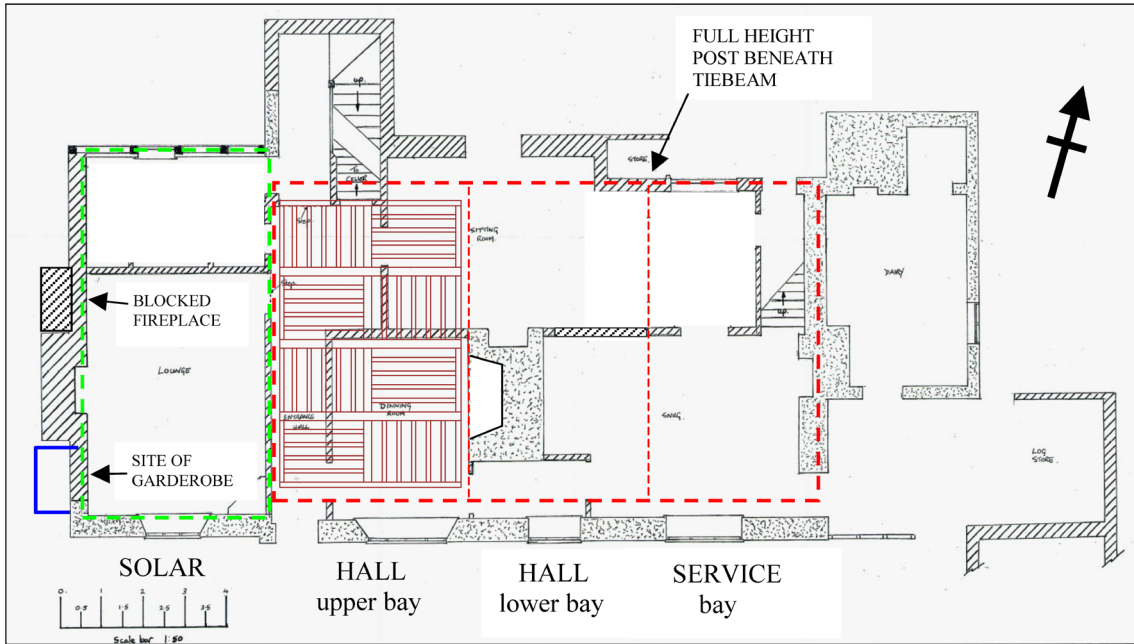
Ground plan of Church House Farm (prior to recent work) with early building sections outlined in green, red and blue. From James 2019 (see Appendix 1)
